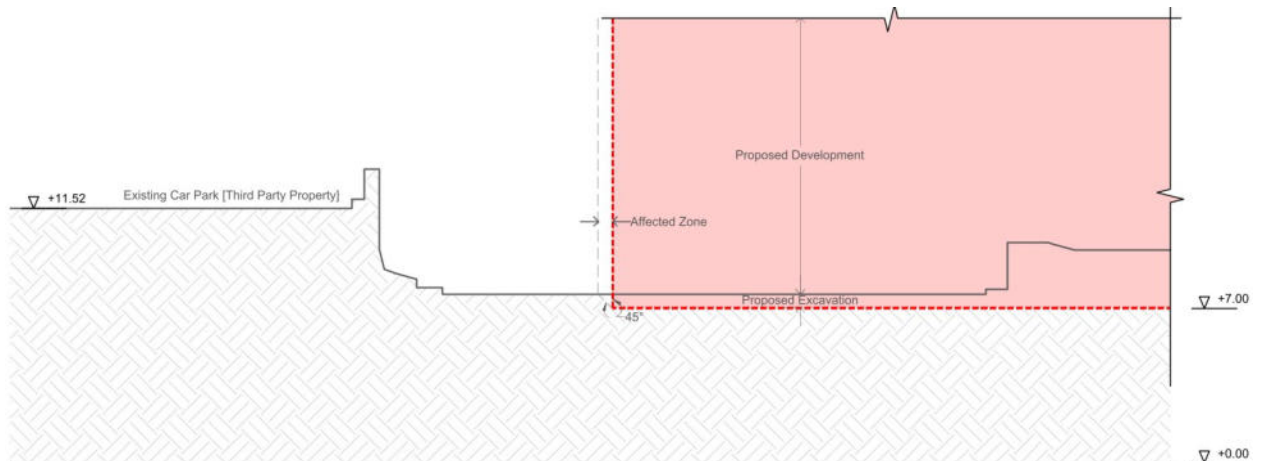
Section 2 through excavation for Block A, close to existing car park, showing affected zone
